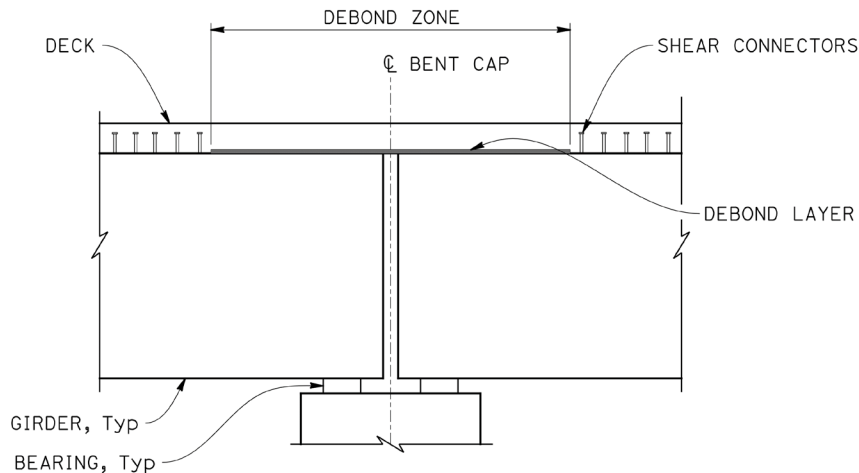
Link Slab Using Conventional Concrete or RSC
